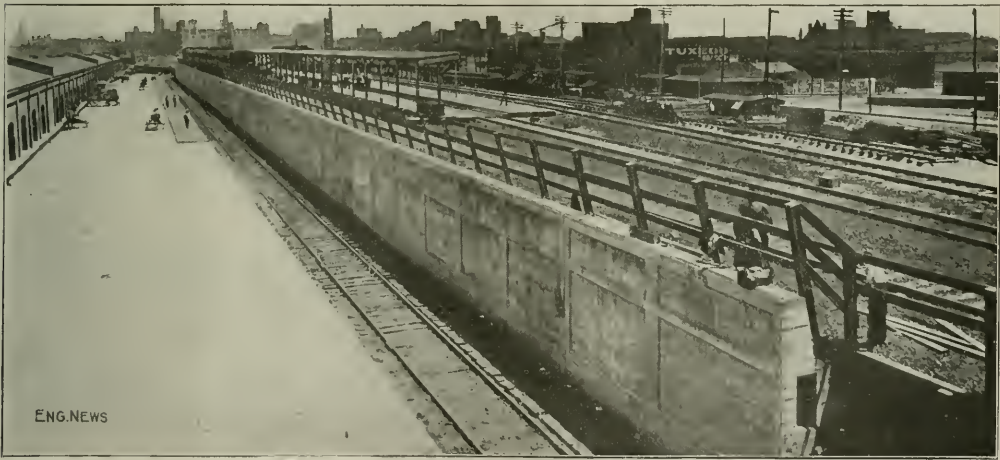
CONCRETE RETAINING WALL (GRAVITY TYPE) AT THE NEW CENTRAL STATION AT MEMPHIS, TENN.
